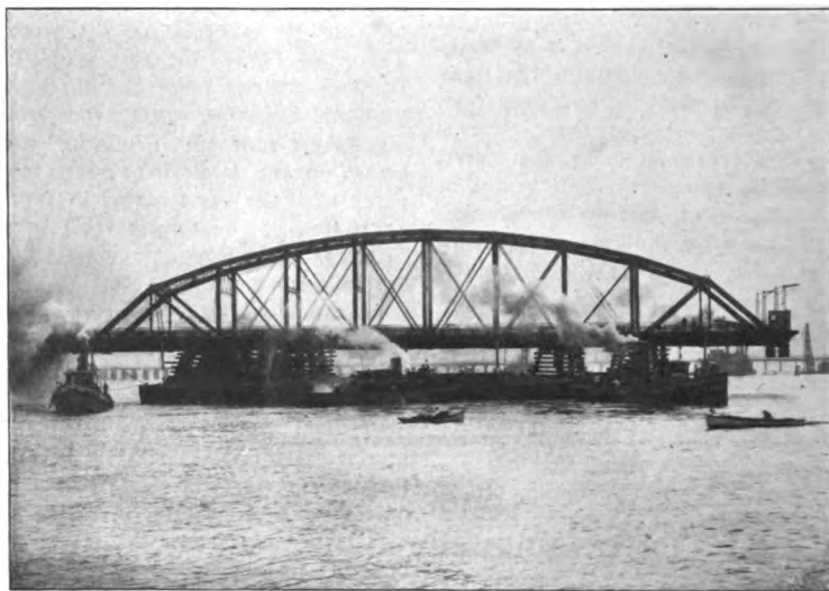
SHOWING THE SPAN CLEAR OF ABUTMENTS AND THE PILE DRIVER TO EXTREME RIGHT, DRIVING PILES NEAR THE NORTHERN PACIFIC RAILROAD BRIDGE, WHERE SPAN WILL REST UNTIL DRAW IS FIXED.
